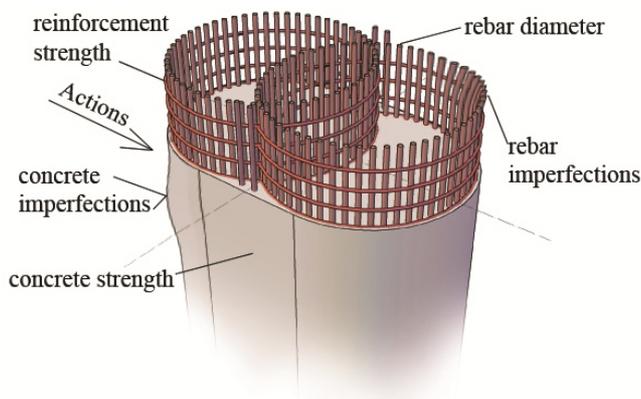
Some of the possible imperfections and uncertainties in the reinforced concrete pier
